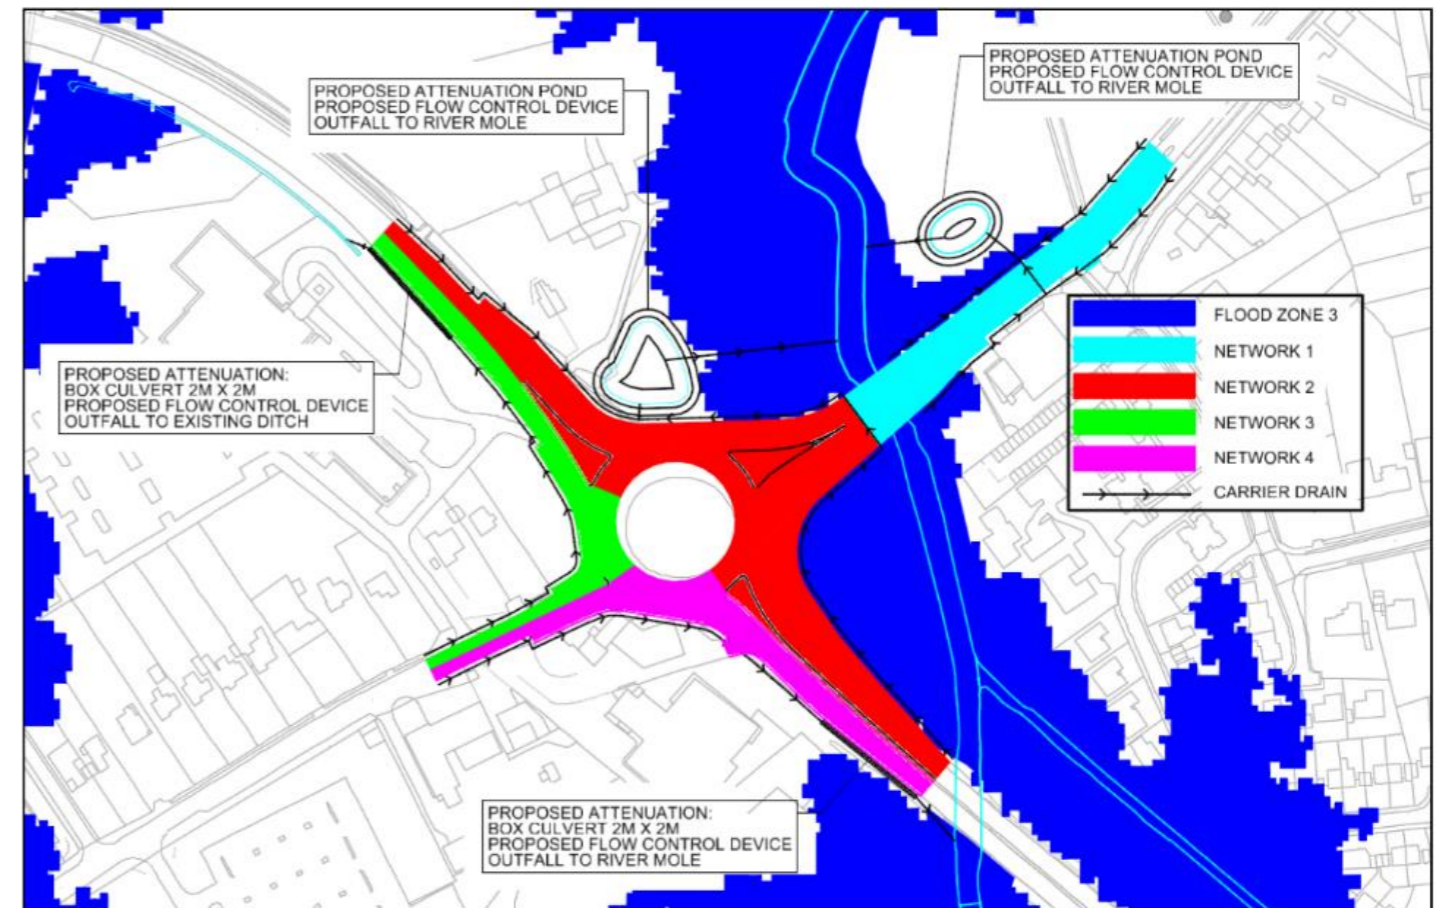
Proposed Drainage Layout - Longbridge Roundabout
